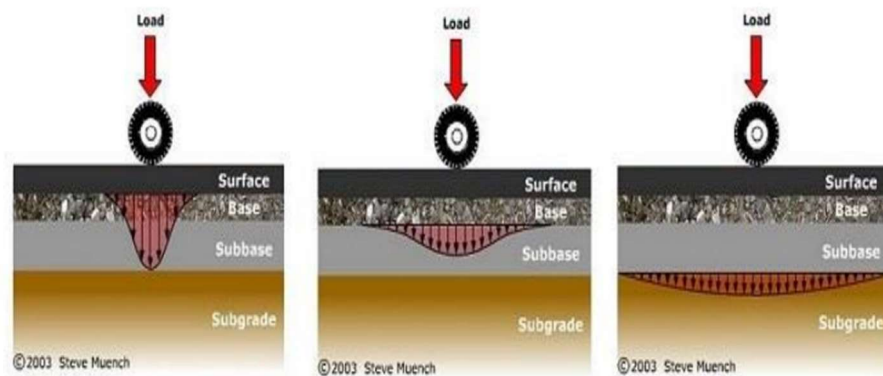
Typical Flexible Pavement and Load Distributions [9]
